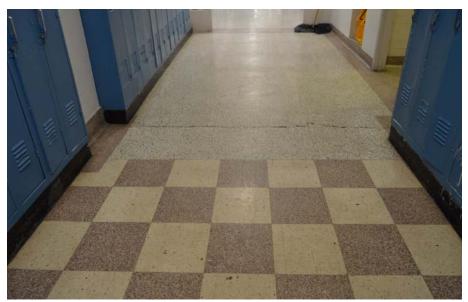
Detail showing where wing's ground-floor corridor in grey and brownish terrazzo meets 1928 building's checkerboard terrazzo
